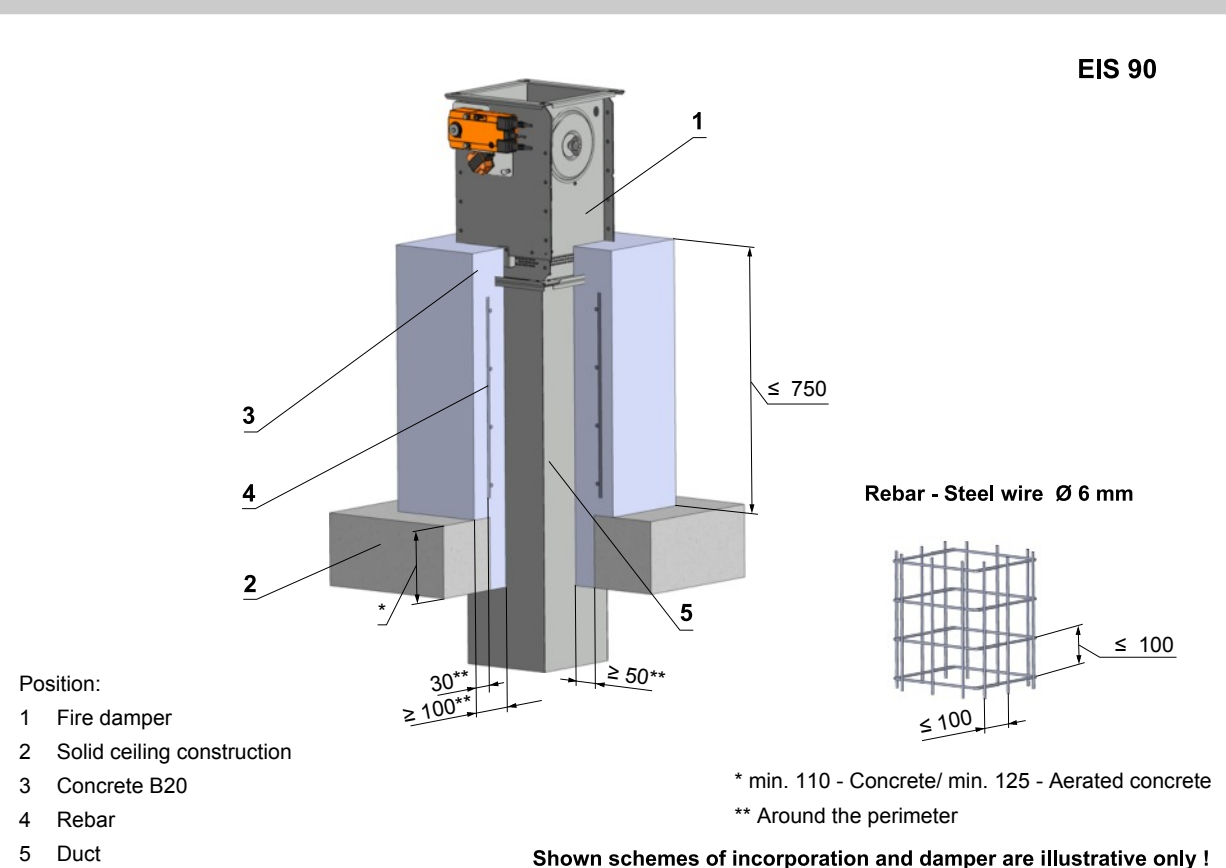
Outside solid ceiling construction - concrete - installation frame E4
